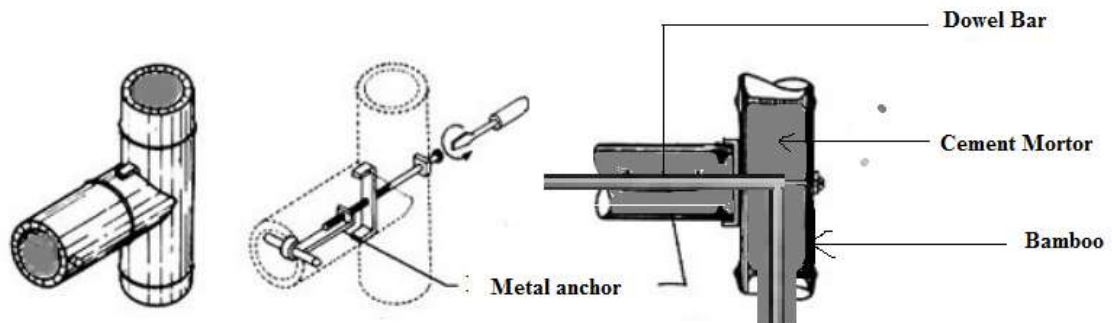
Bamboo Beam Column joint metal anchors and dowel bars with bolts
